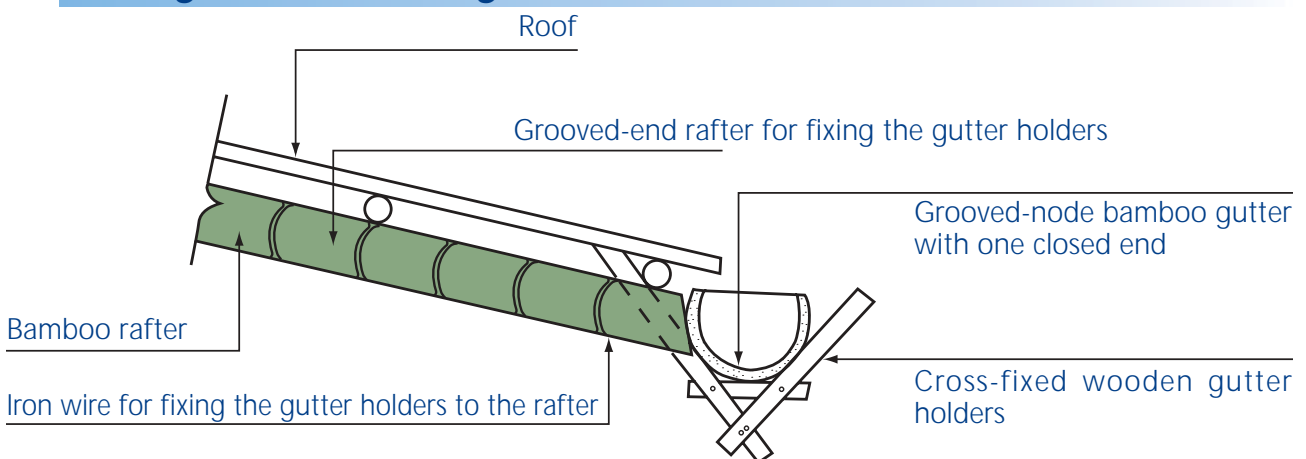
Fix the bamboo gutter to the bamboo roof structure using cross-fixed wooden gutter holders.
